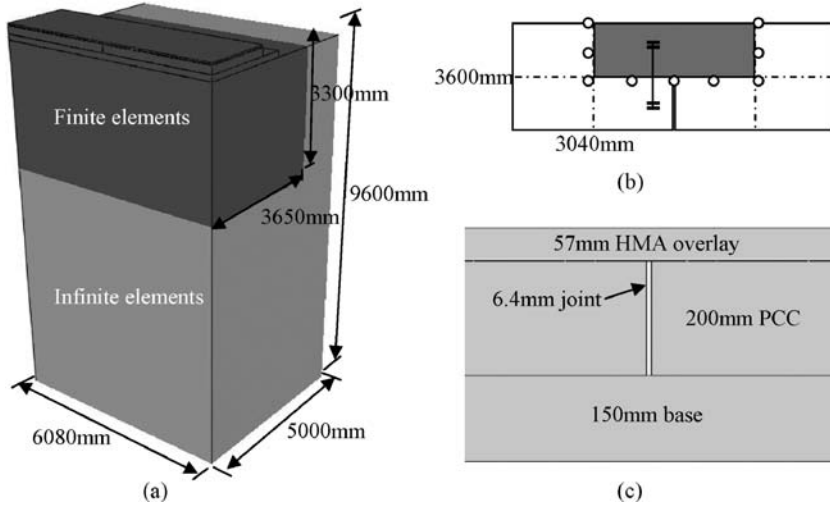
(a) Geometry of HMA overlaid pavement model; (b) geometrical symmetry; and (c) pavement profile.
